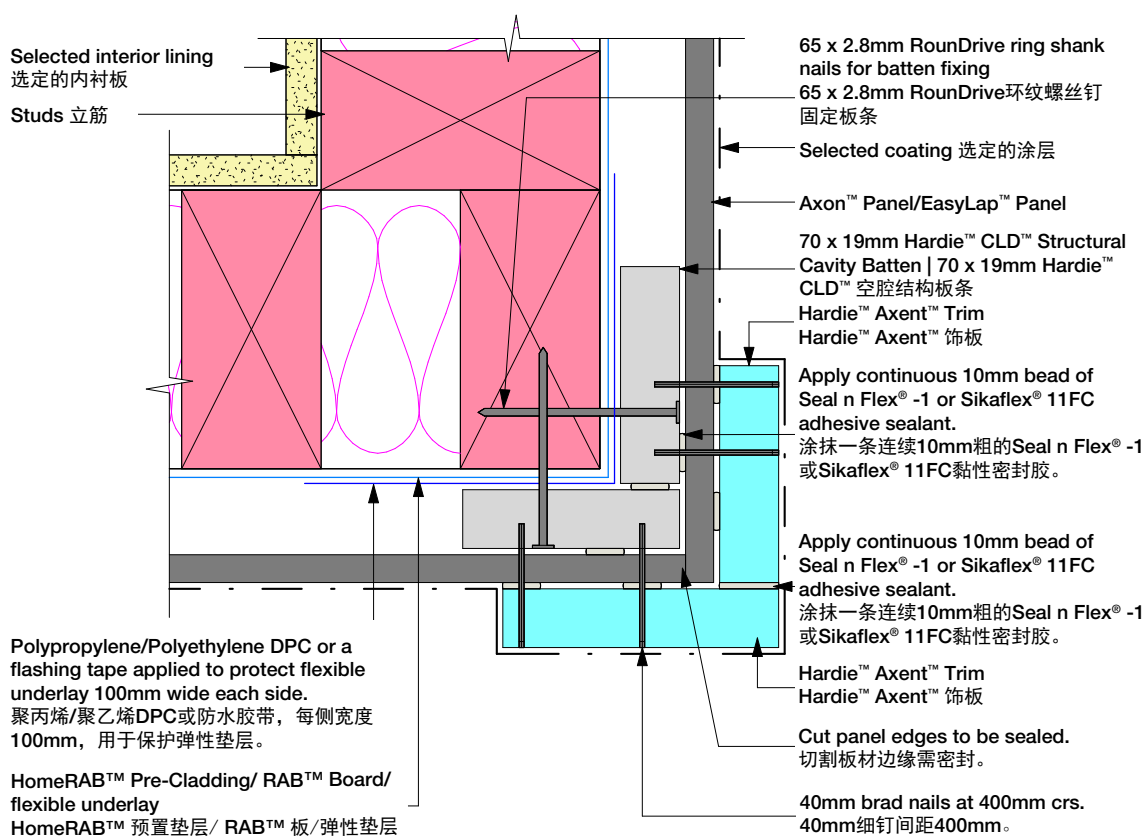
Jointing of Hardie™ CLD™ Structural Cavity Batten
